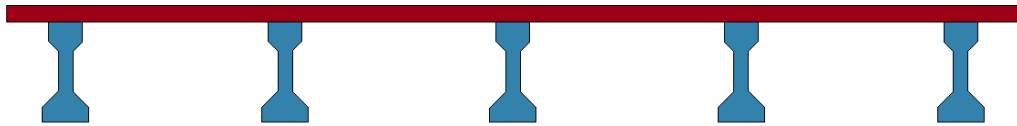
Cross-Sectional View of Archetype 2 Bridge Model
